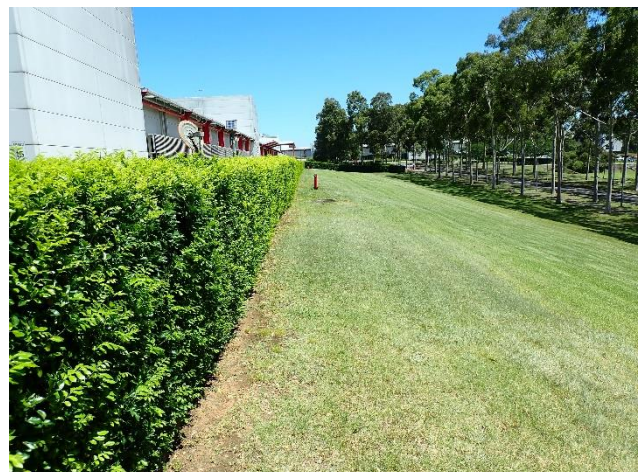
Extensive artificial embankment on the western side of the existing Mixing/Forming Building sloping down to the access driveway. Aspect south
